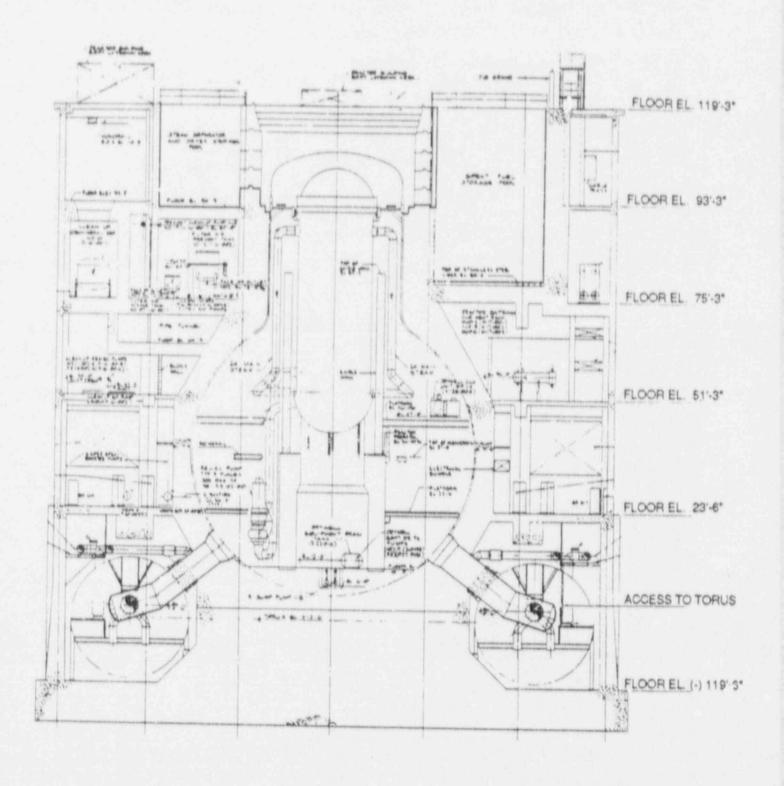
Oyster Creek Reactor Building Elevation Drawing.
